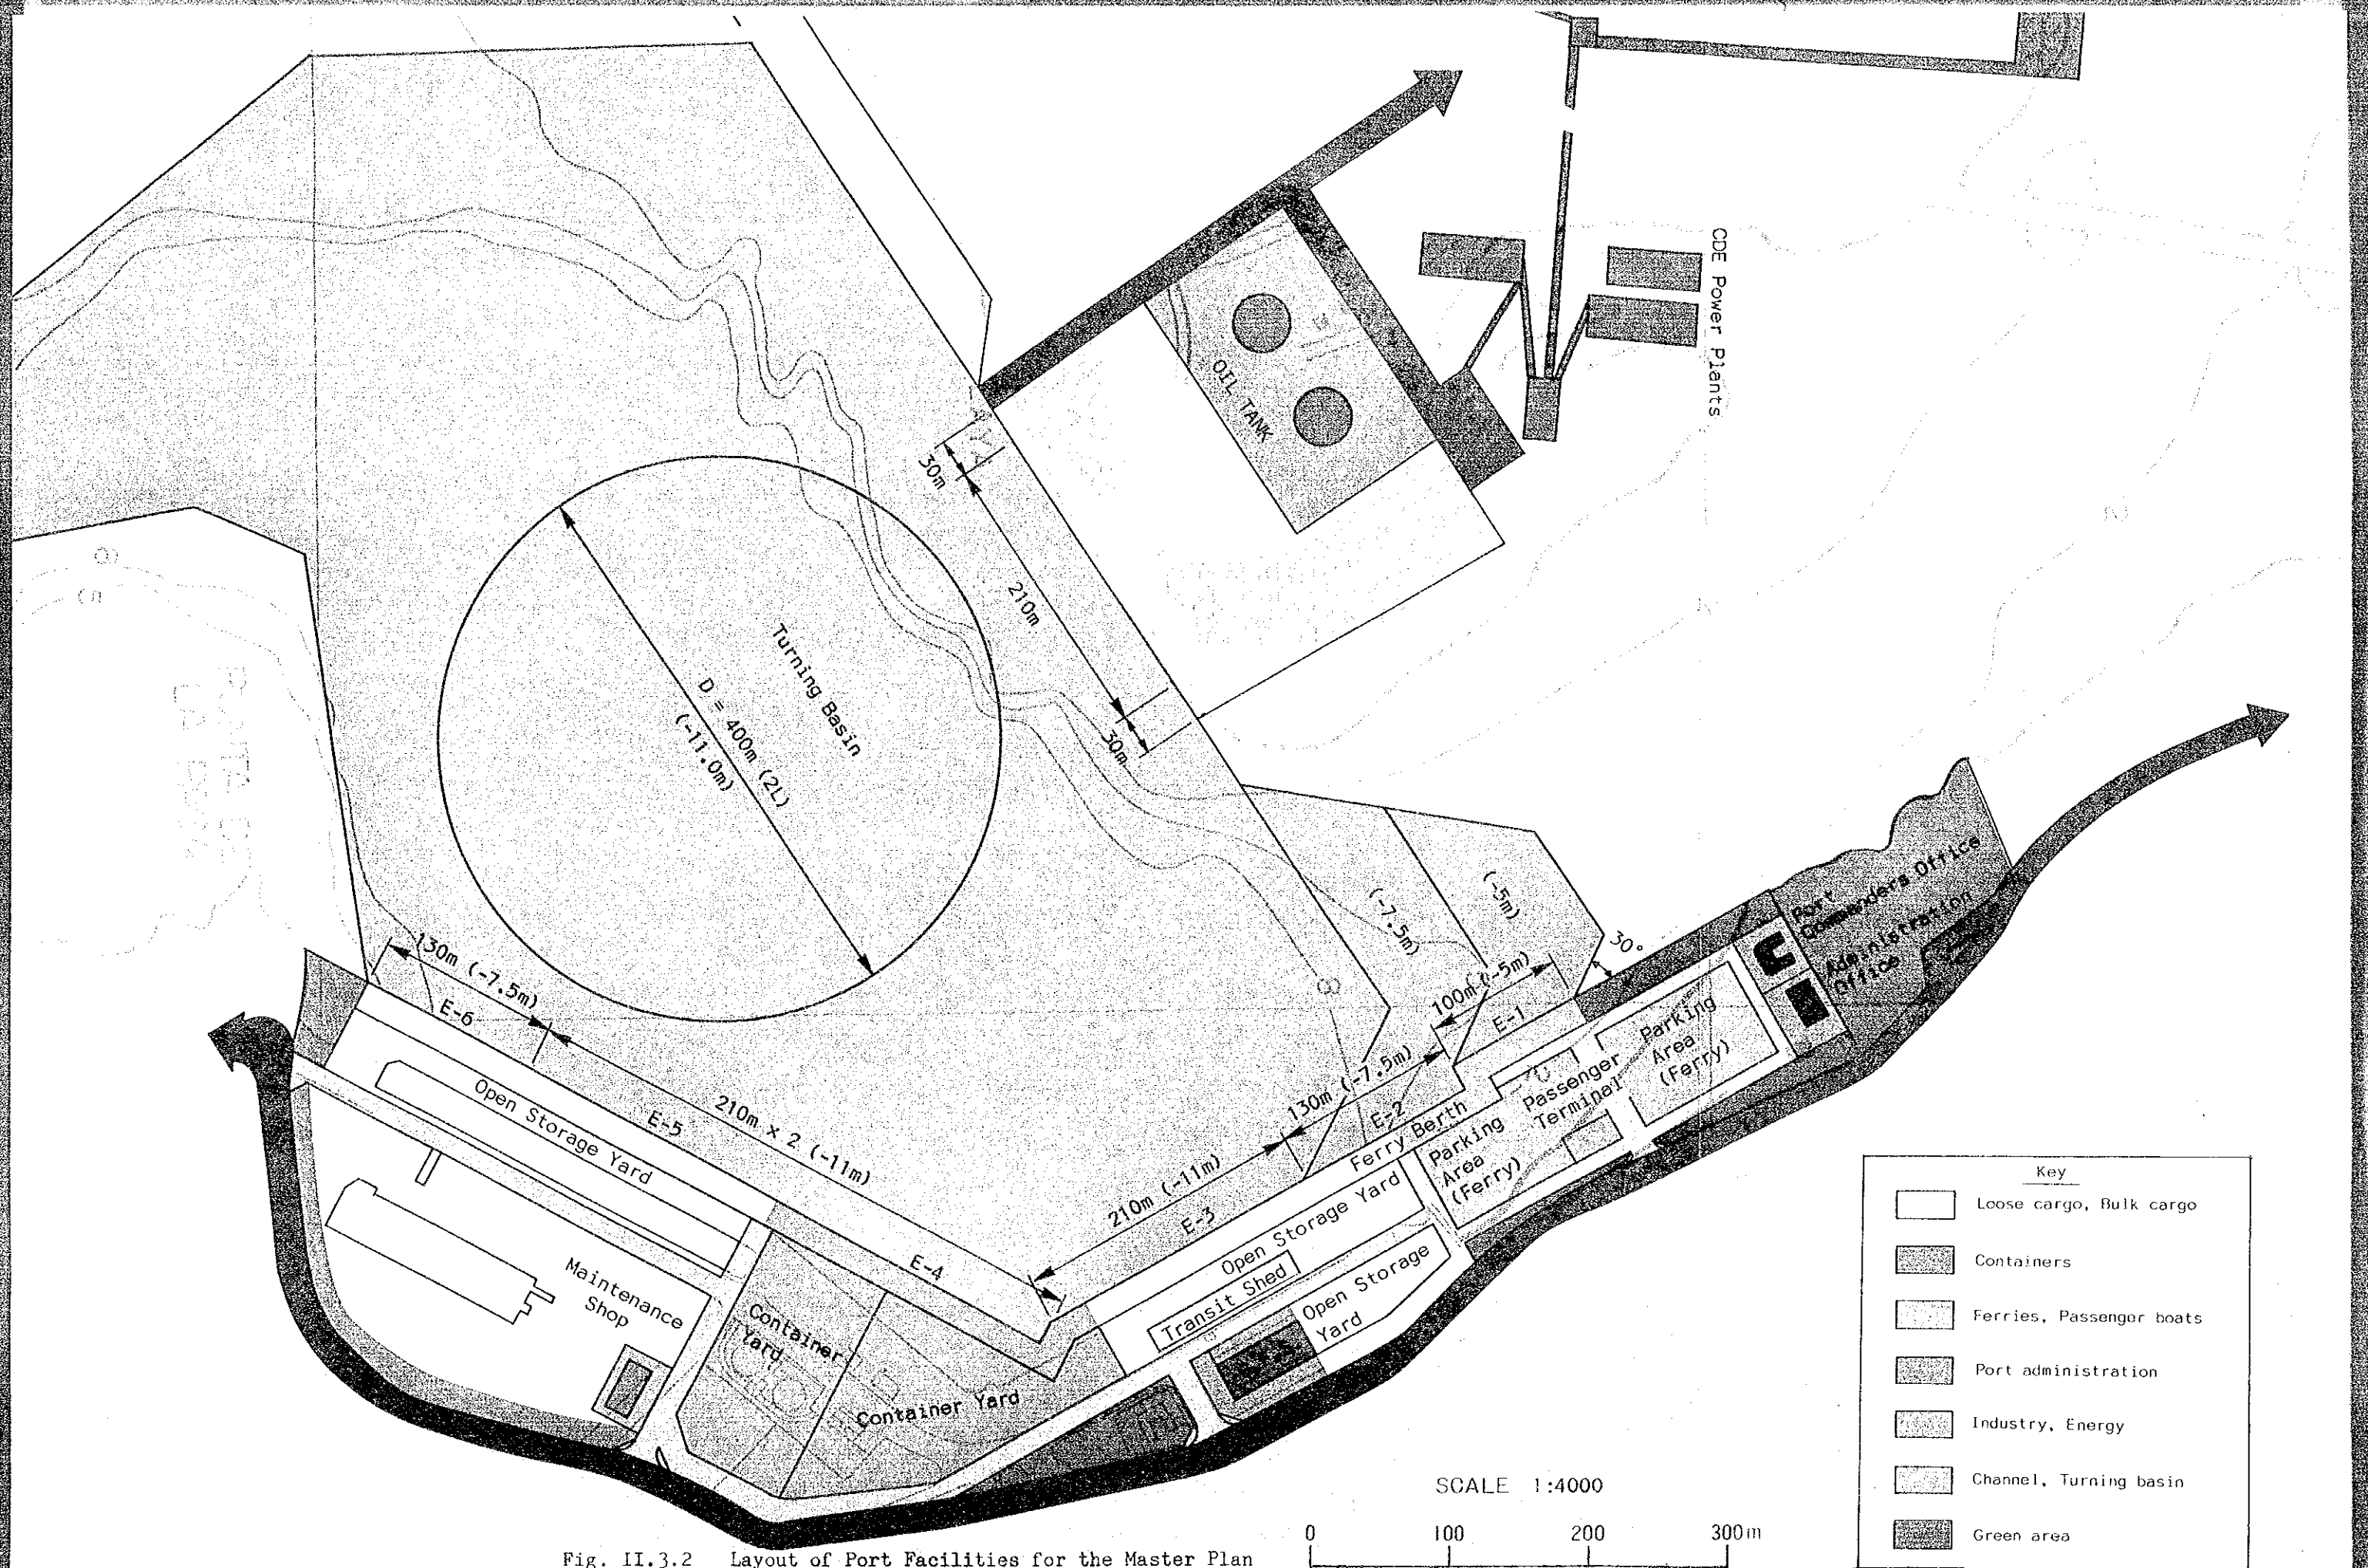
Layout of Port Facilities for the Master Plan
